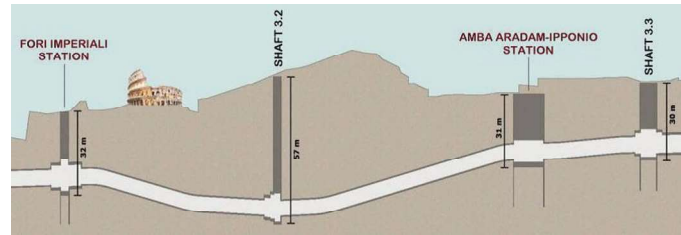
Longitudinal section of the tunnels excavation layout between S. Giovanni shaft and Fori Imperiali stations.
